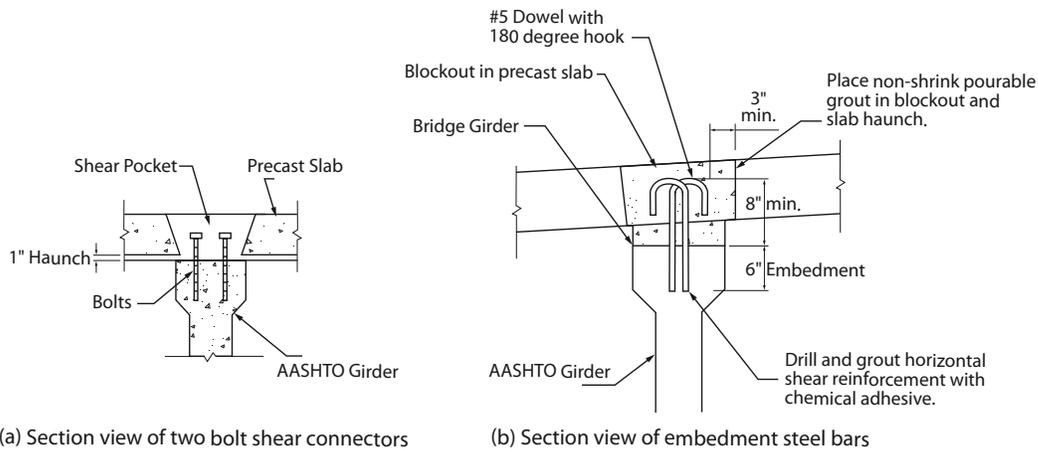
Section views of shear connector for precast concrete girders.
